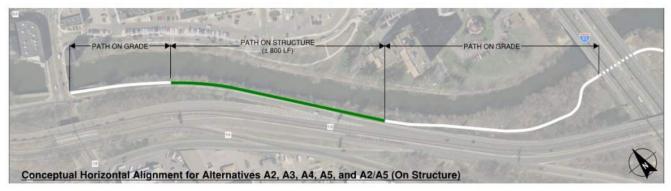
Conceptual Horizontal Alignments for Location A Alternatives
